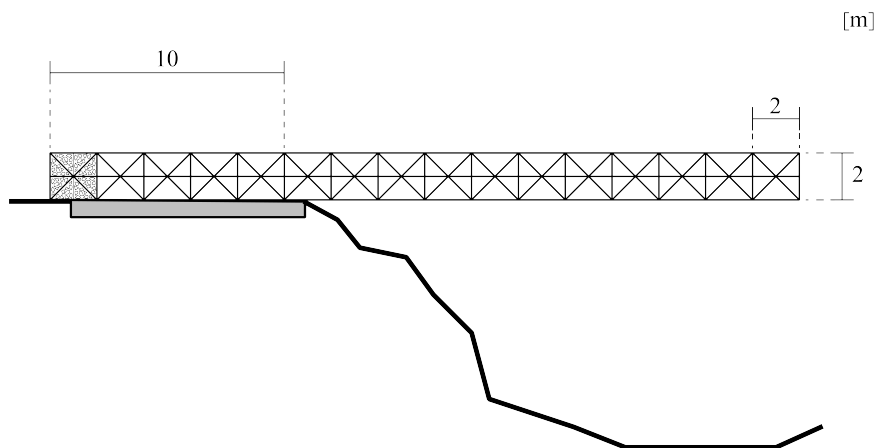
Example drawing of the erection of a 30 meter bridge.
